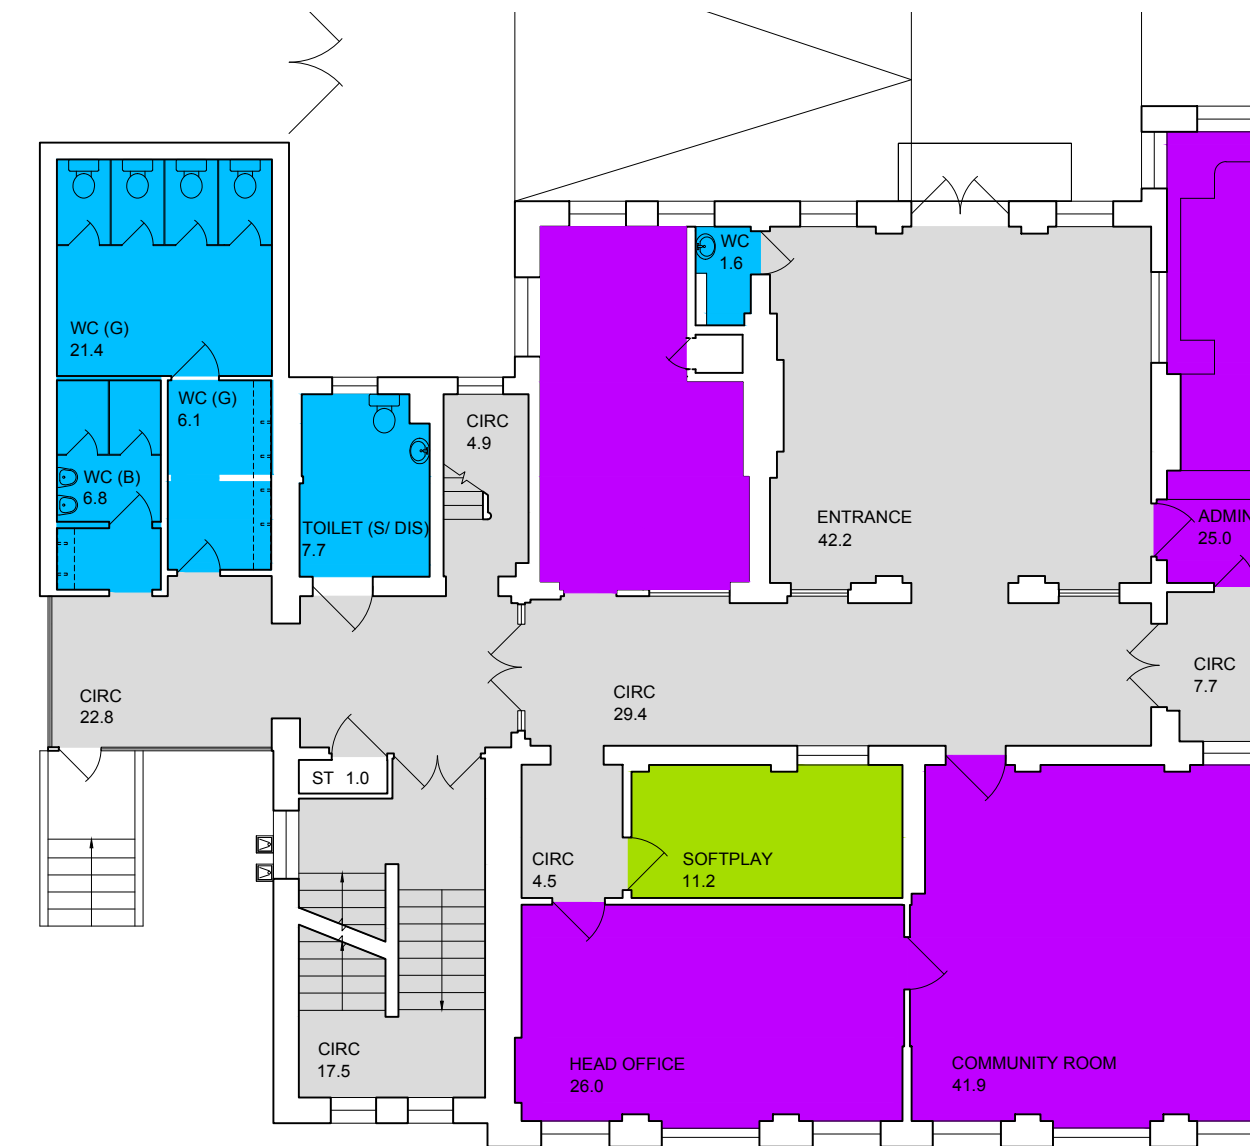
1970s WC Block and Soft Play Room as existing.
